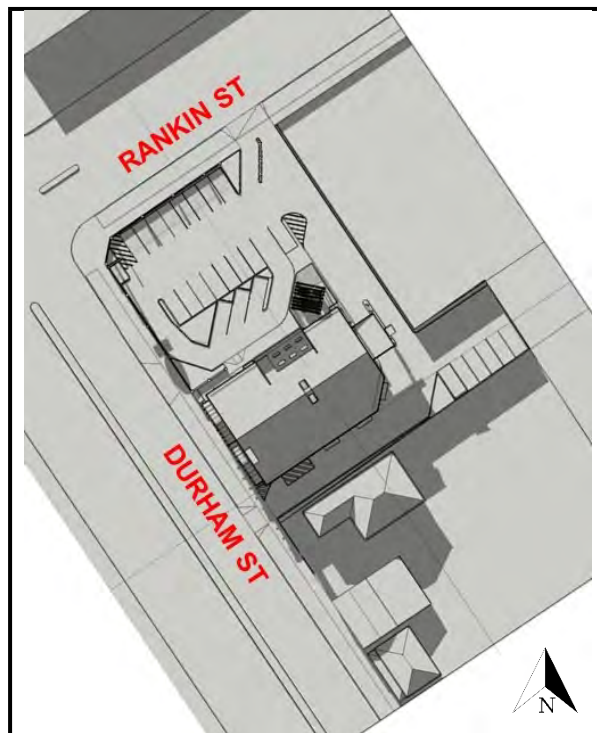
Overshadowing Plan – 3:00pm on 21 June
